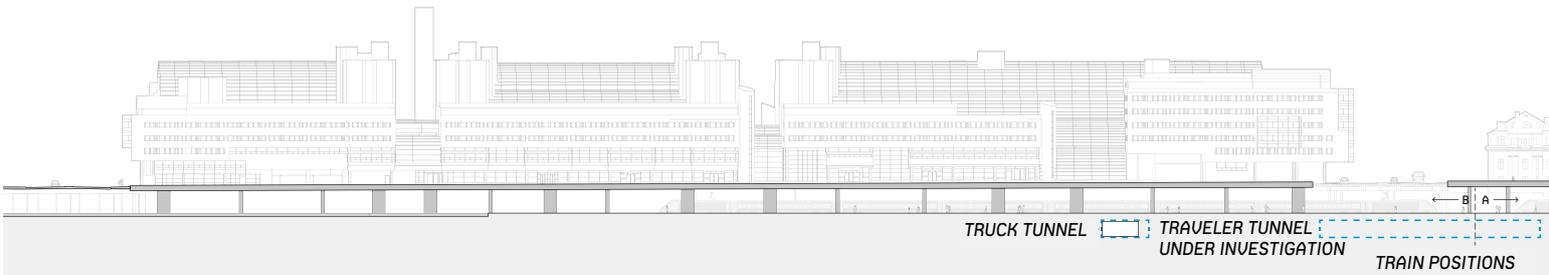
Longitudinal section facing east of Terminalslingan, the future decking, new tracks and platforms
